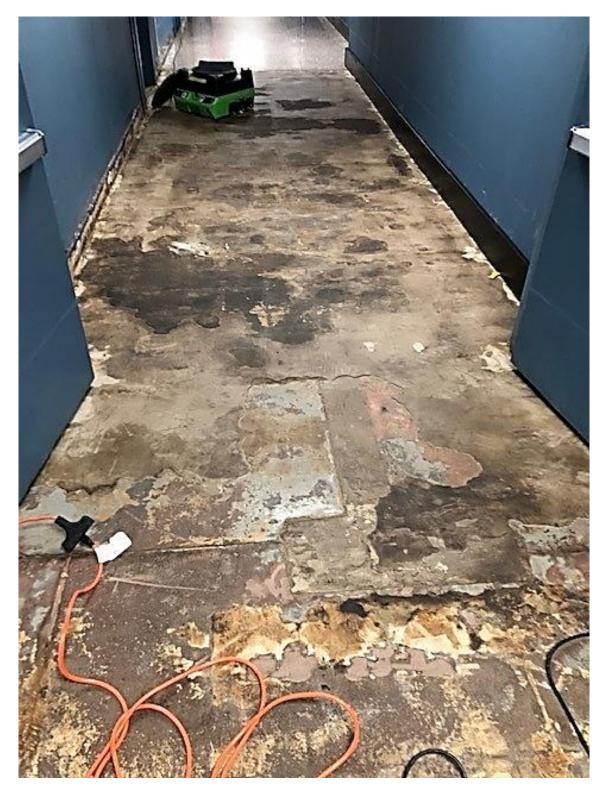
POST ASBESTOS ABATEMENT FLOOR PATCH IN CORRIDOR BETWEEN CAFETERIA & BOILER ROOM
